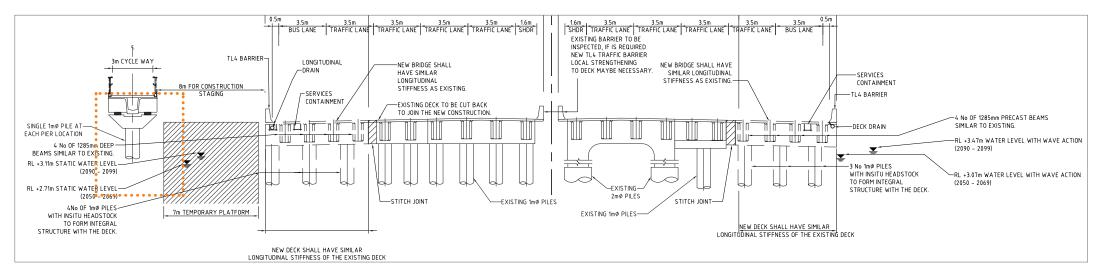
Engineering arrangement proposals, Whau River bridges
